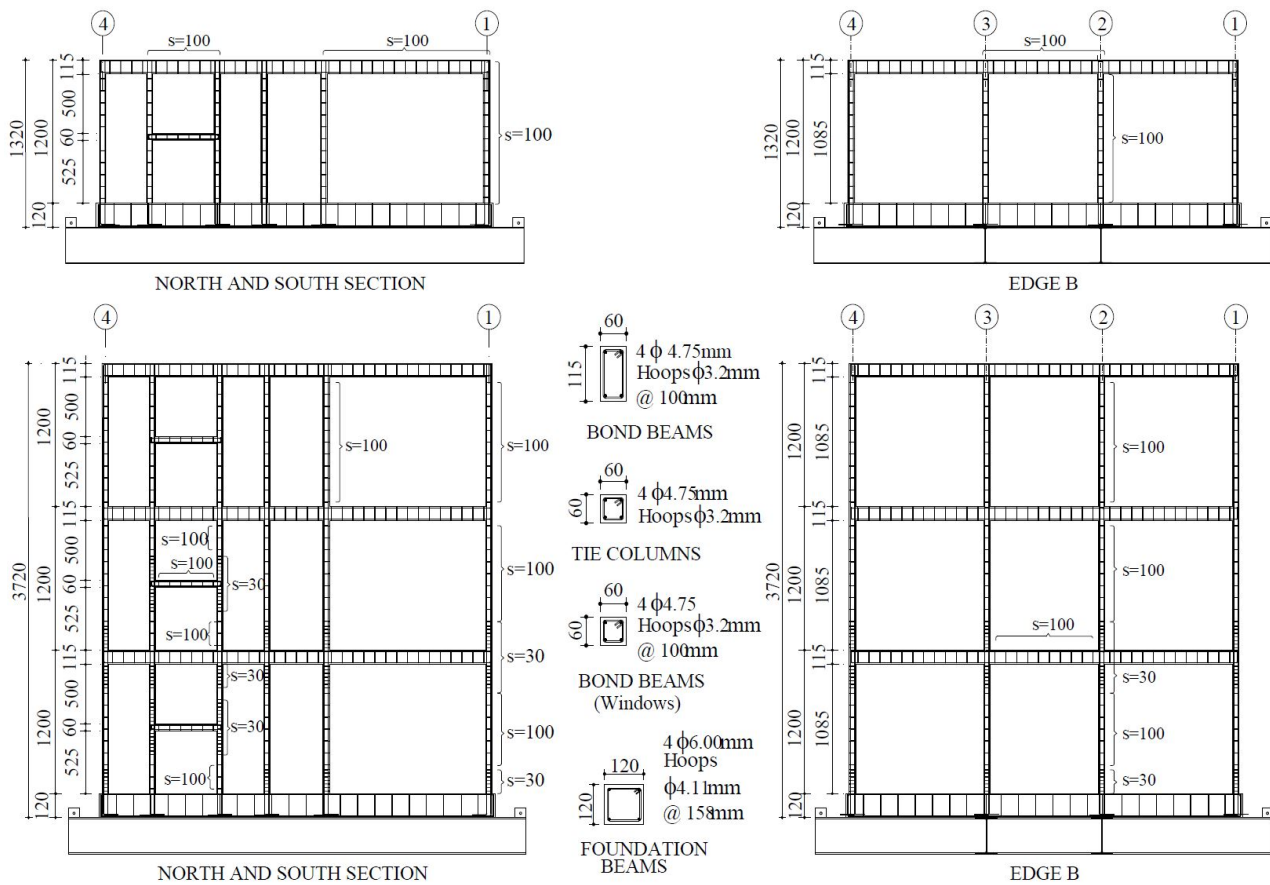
Reinforcement layout for specimens M1 and M3 (units in mm)
